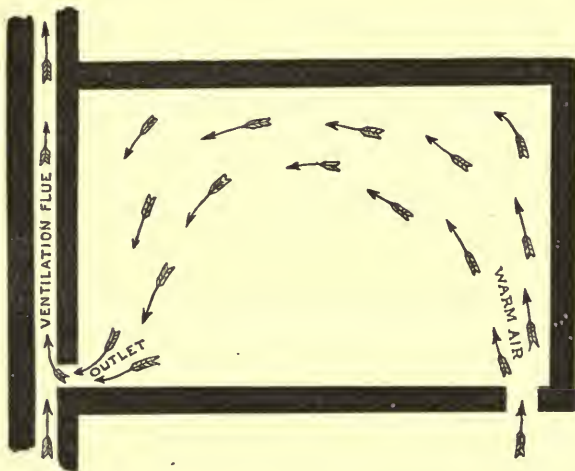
GRAVITY SYSTEM, WITH INLET AND OUTLET ON OPPOSITE SIDES AND NEAR THE FLOOR.
